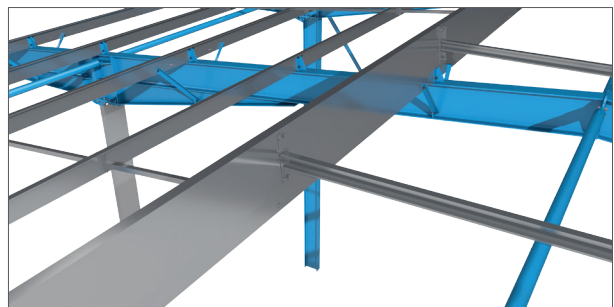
Detail of a bracing strut connection to the skylight frame section. A standard joint made by M16 bolts.
